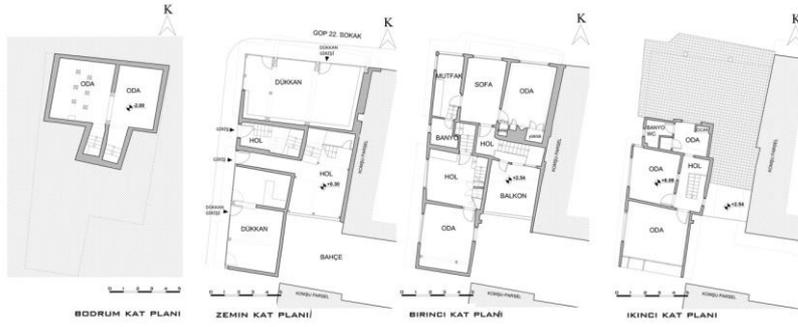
The survey plan of the traditional house at block 135, lot 75 (*Yaprak Mimarlık Office archive*)
